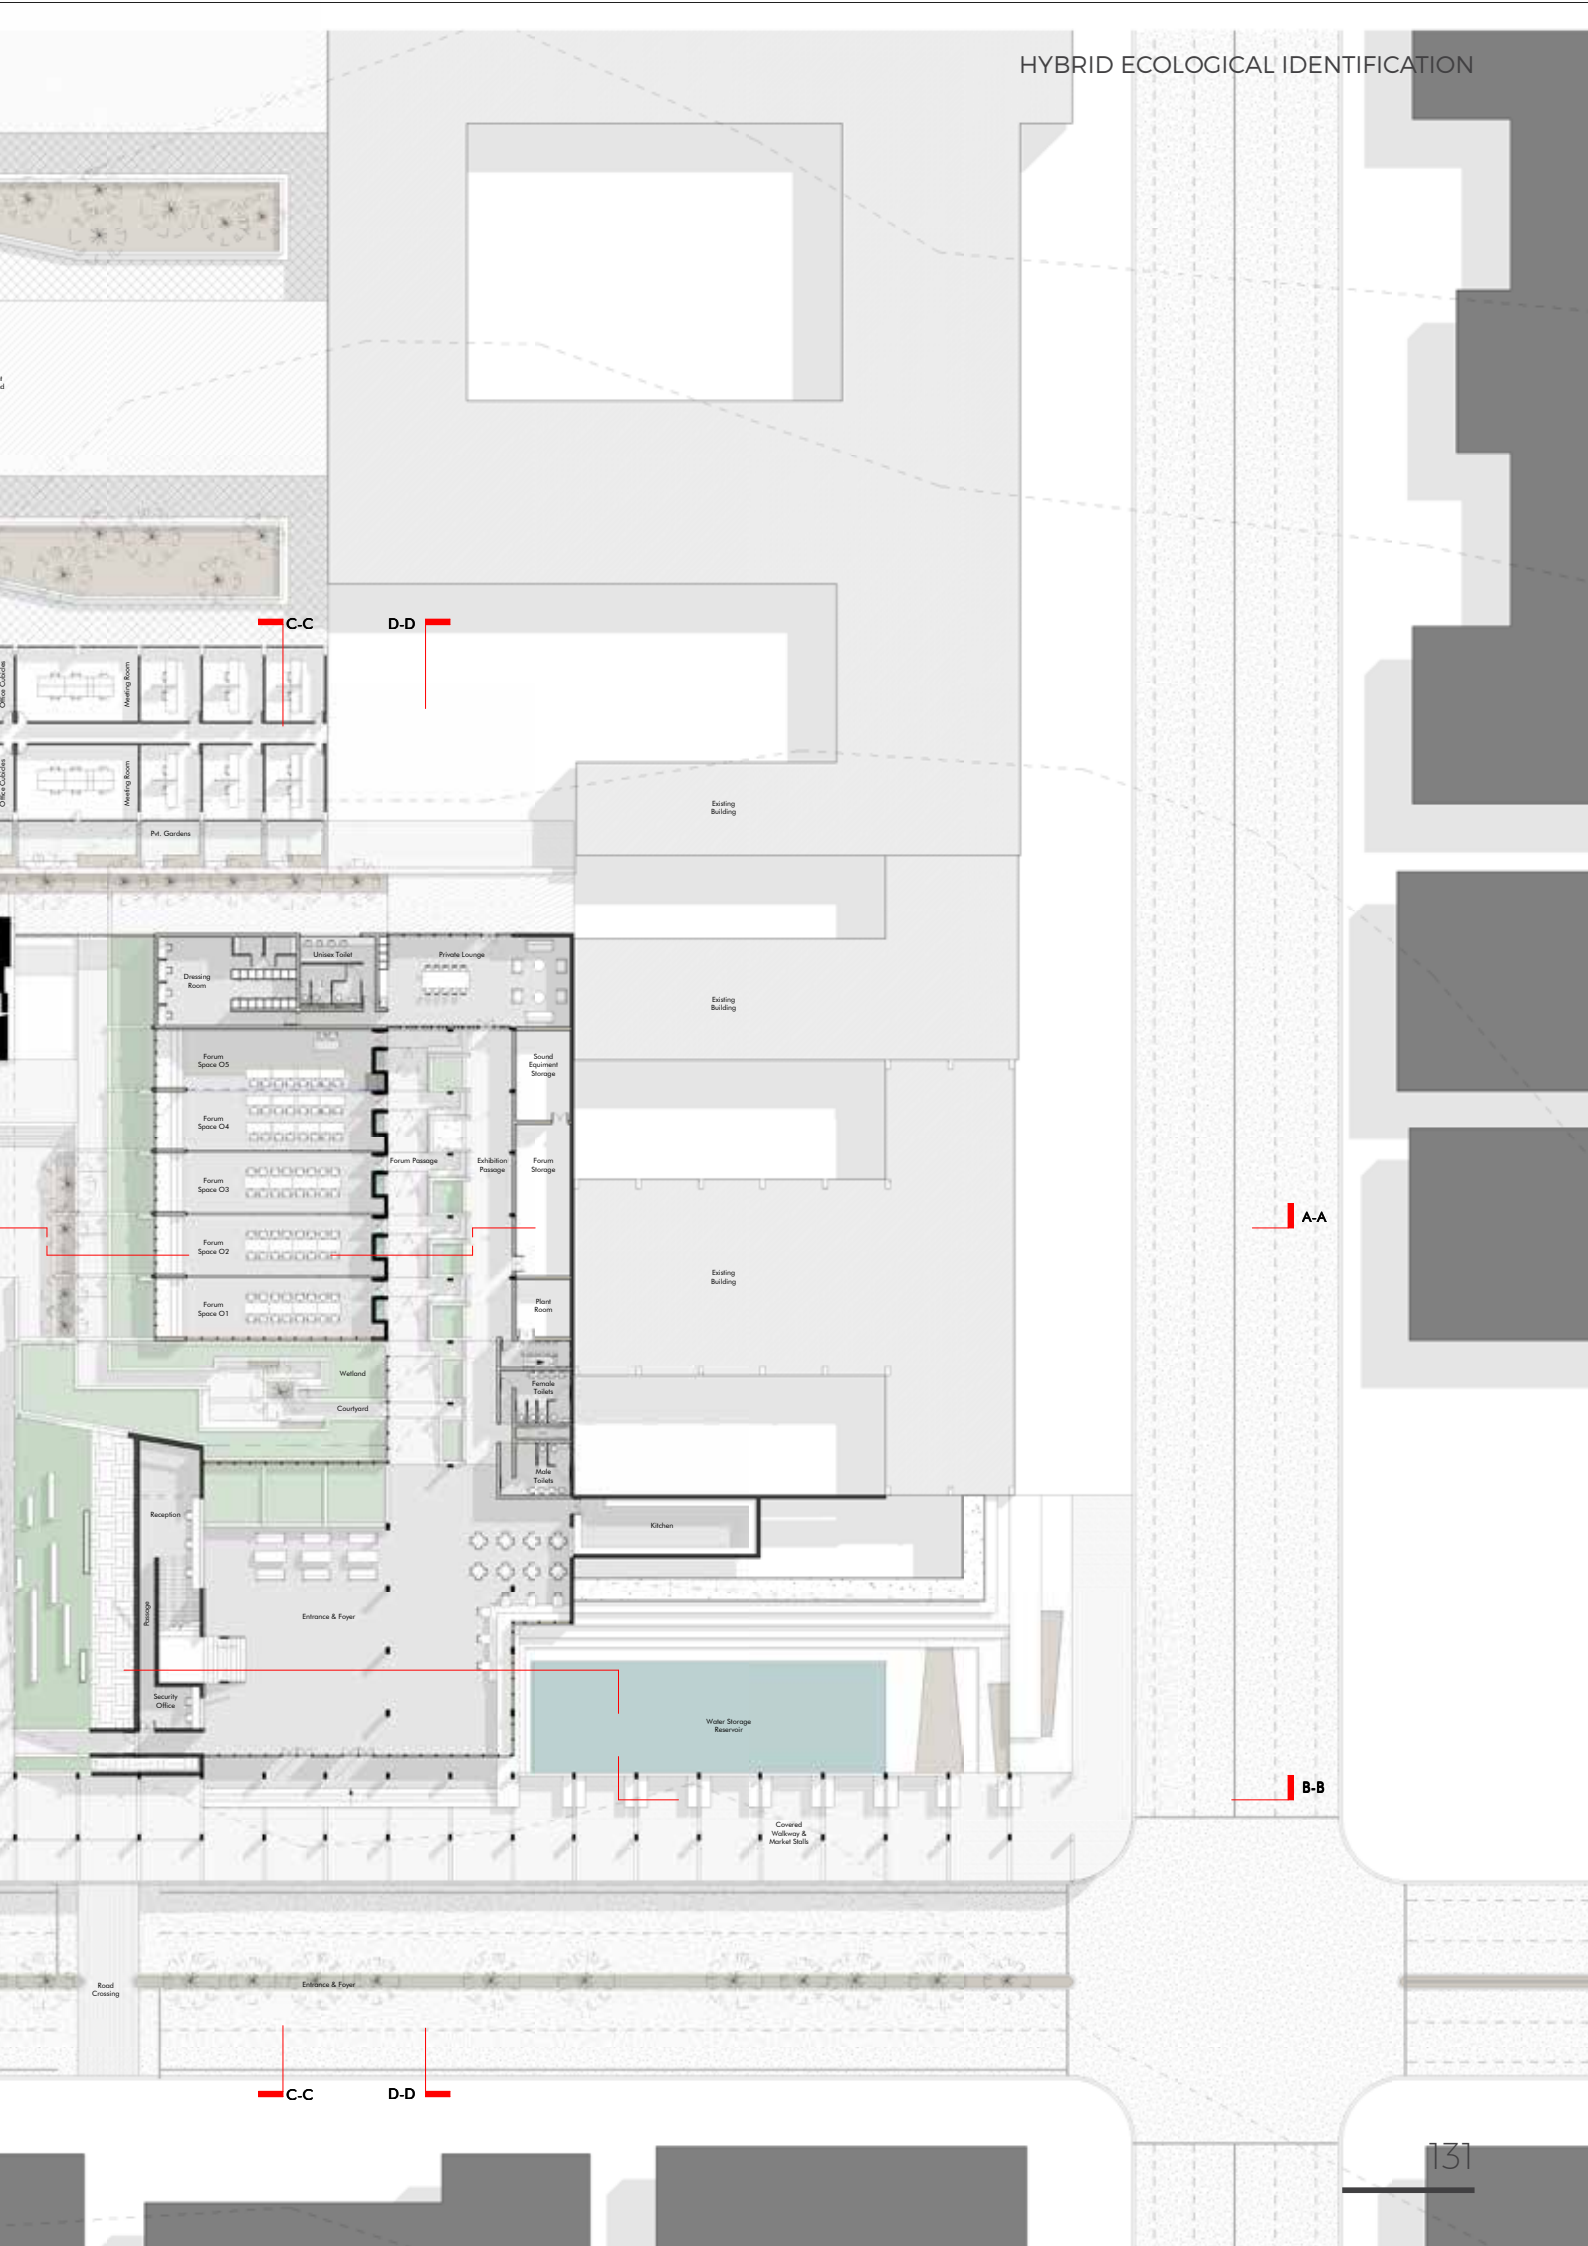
Ground floor plan (unscaled, original scale 1:200) (Author: 2019)
